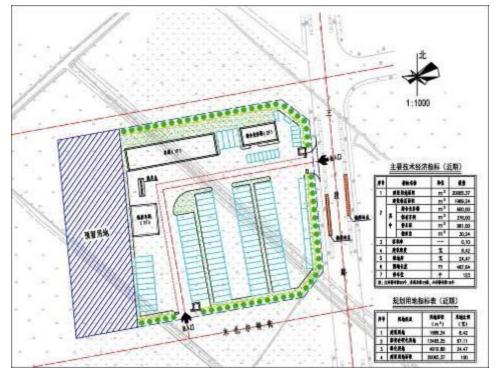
Layout plan of integrated bus stations in Yining economic park
